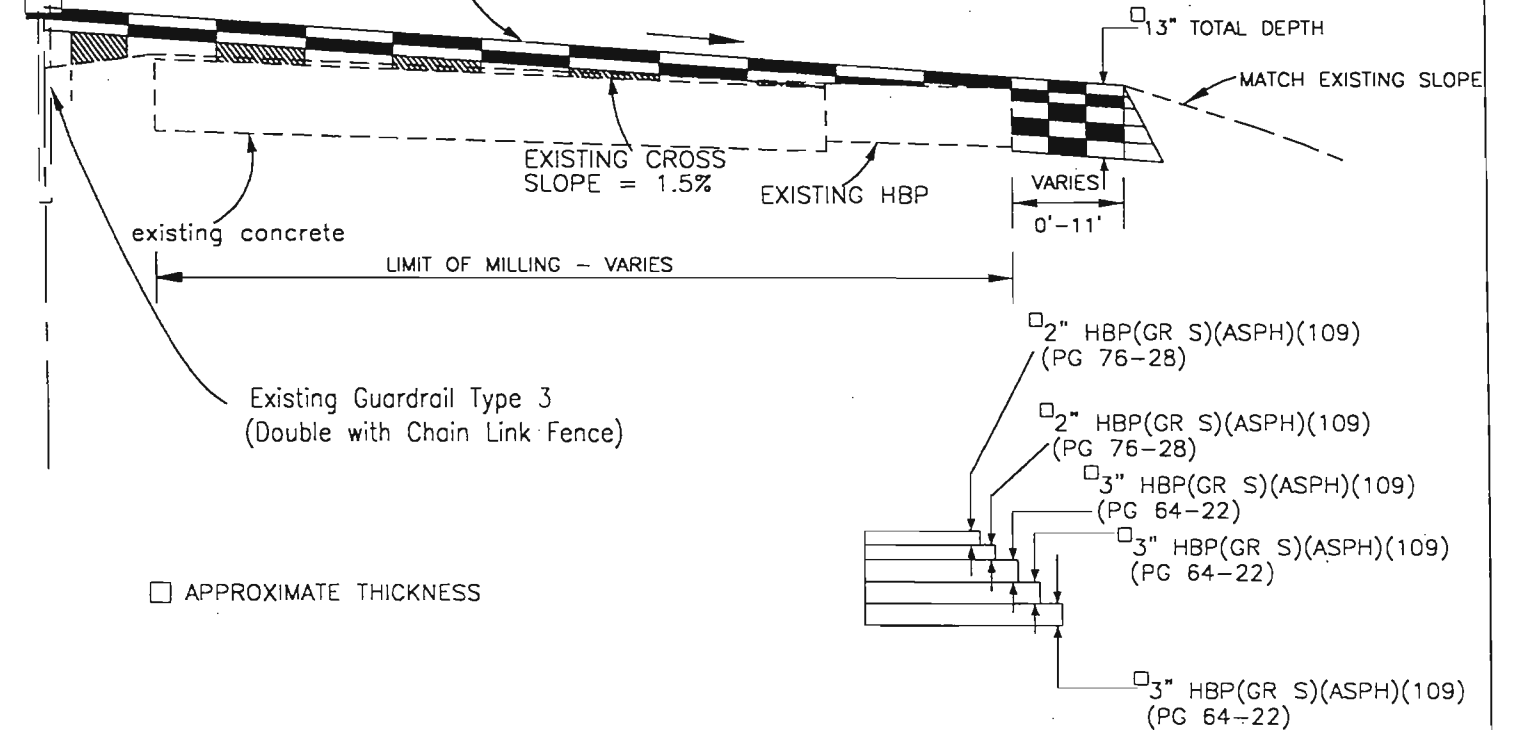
DETAIL OF MILLING AND PAVING OF RAMPS WITH CURBS
